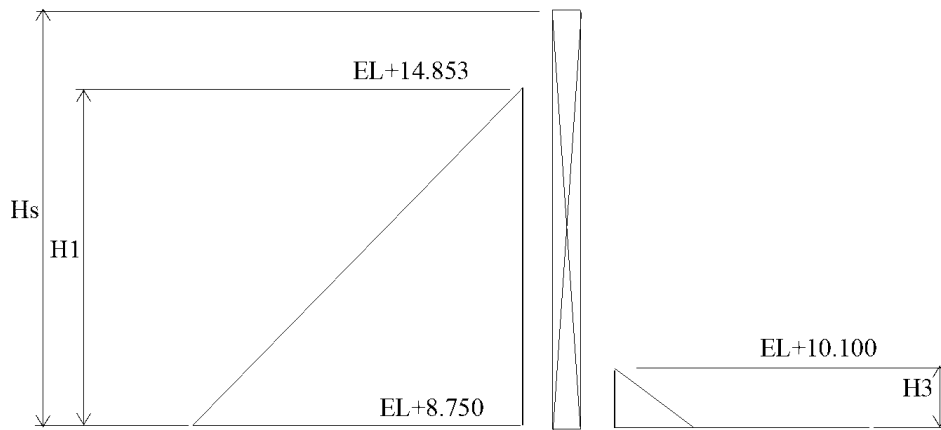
Standard Elevation Drawing of Drainage Outlet(Cainta River OUTLET 1)
